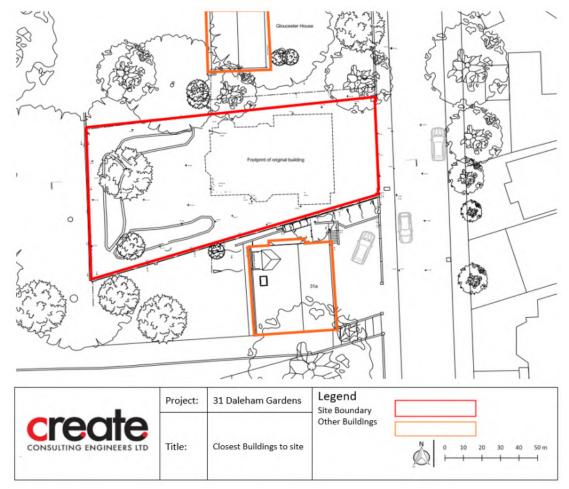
Proposed site boundary and surrounding buildings (source: Mole Architects)
